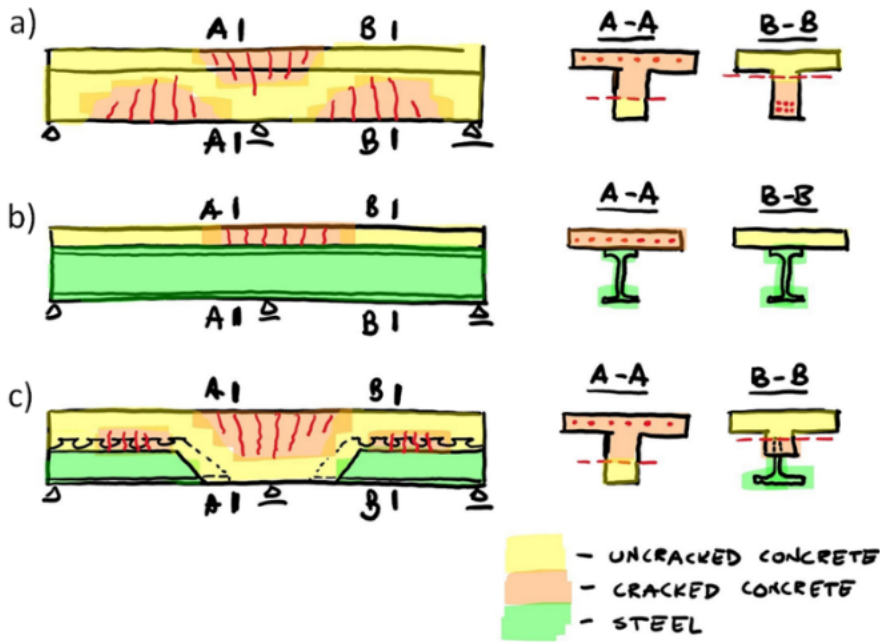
Concrete cracking ranges in (a) reinforced concrete beam, (b) composite beam, (c) hybrid beam.
